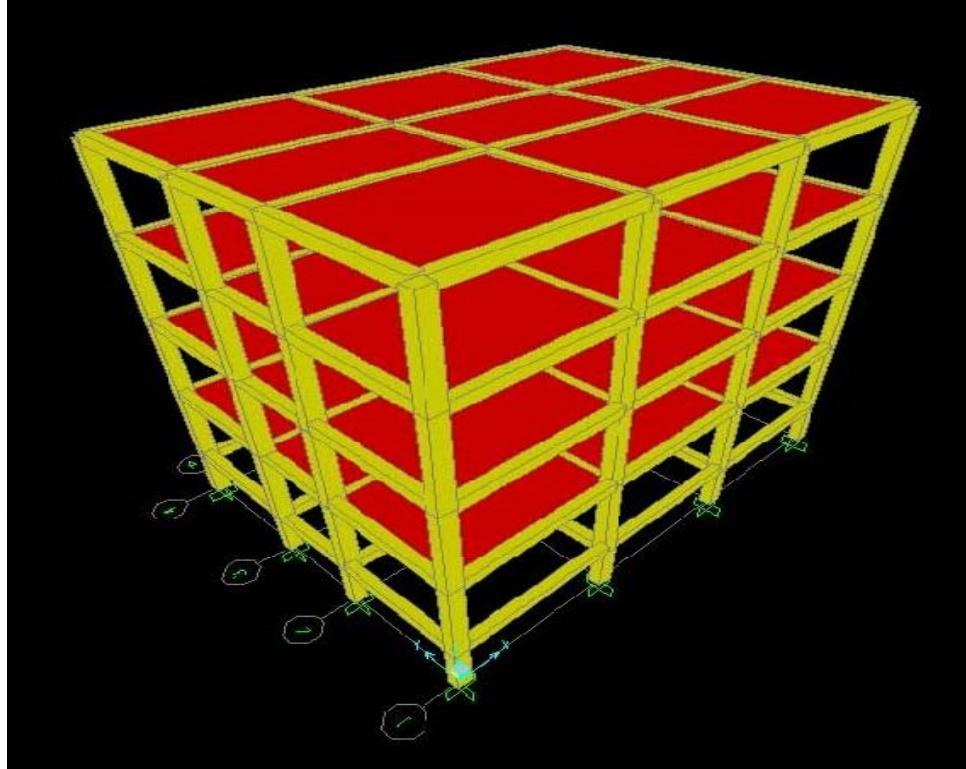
Isometric view of rectangular model with slab diaphragm
